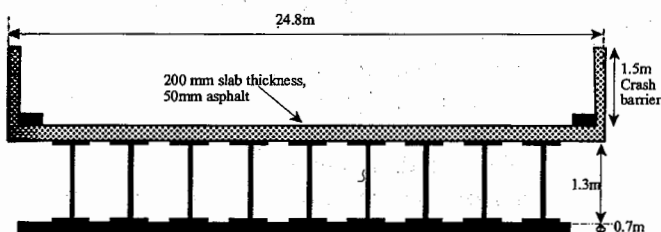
Schematic of the Showa Bridge deck (adapted from Iwasaki, 1984)
